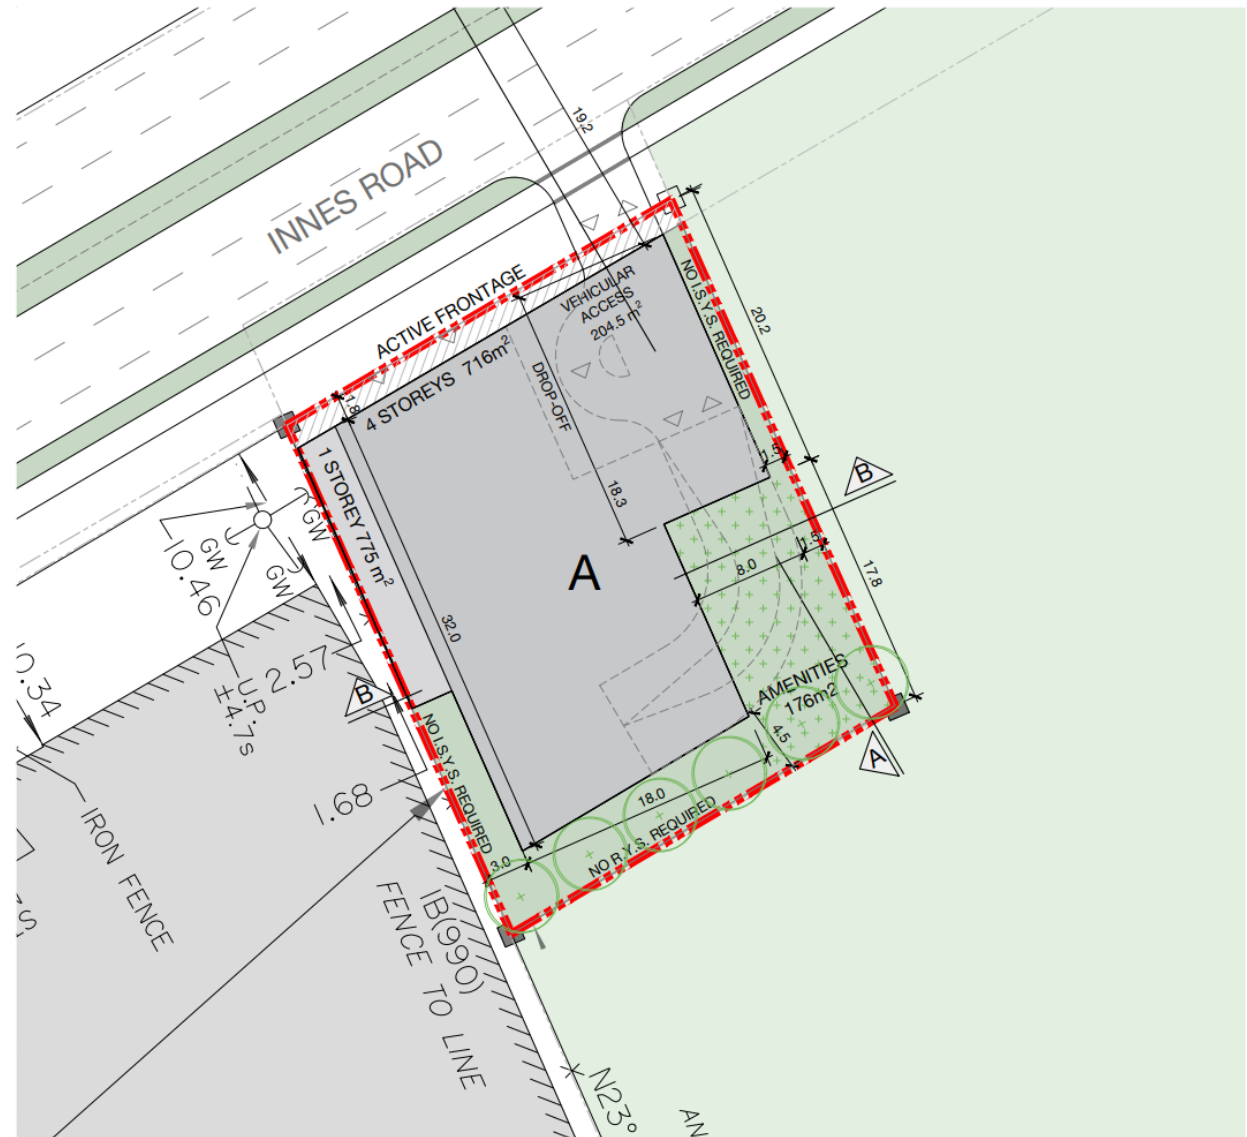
Proposed concept plan showing the low-rise mixed-use building. Source: 3636 Innes Road Ottawa Concept Plan, Drawing P1, prepared by Fotenn Planning + Design, dated January 9, 2023, revision 7 dated July 23, 2024.
